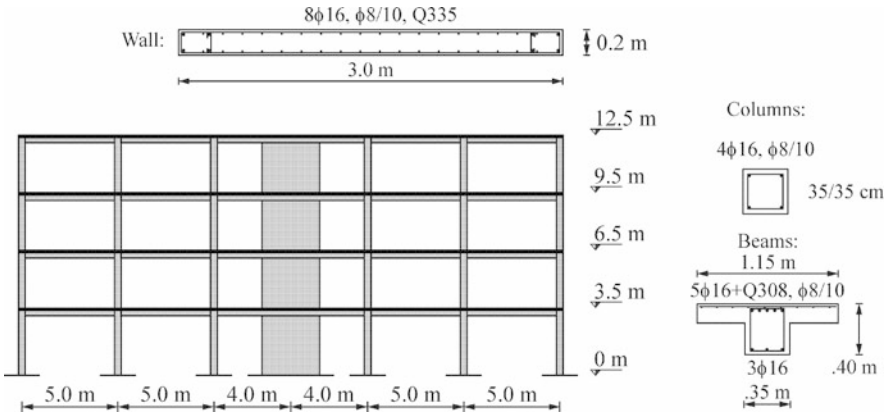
The elevation and the typical reinforcement of the four-storey wall-equivalent dual structural system
